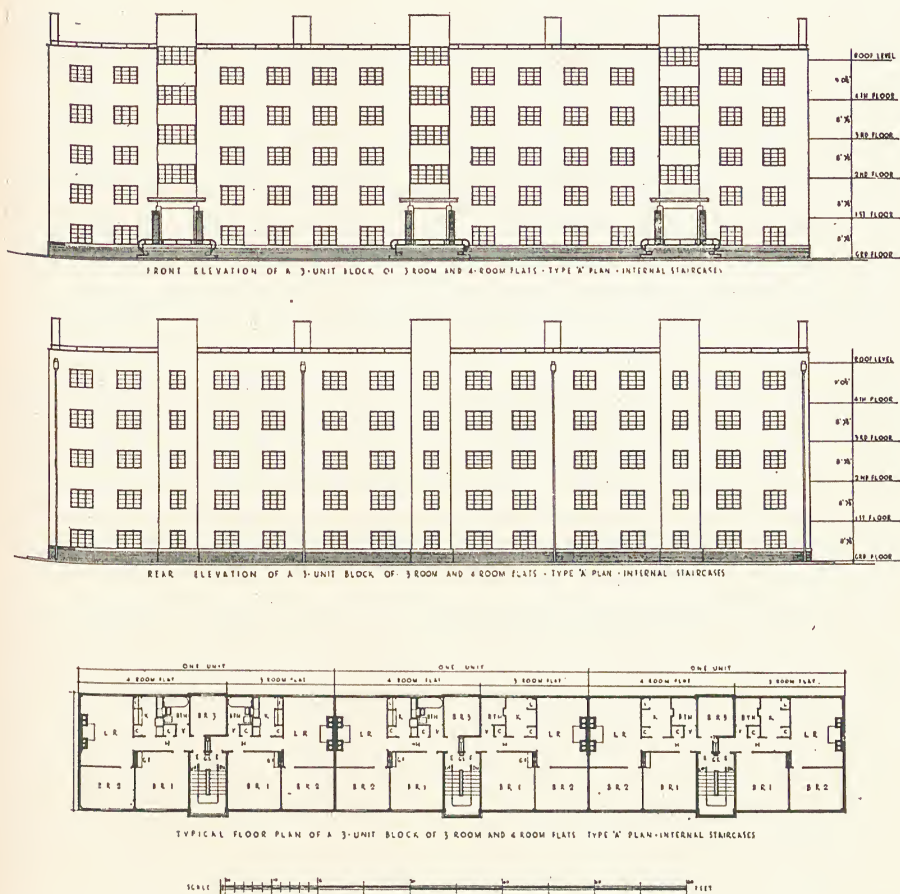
TYPICAL BLOCK OF THIRTY TENEMENTS, FIVE STOREYS HIGH, AND OF THE INTERNAL STAIRCASE-APPROACH TYPE
